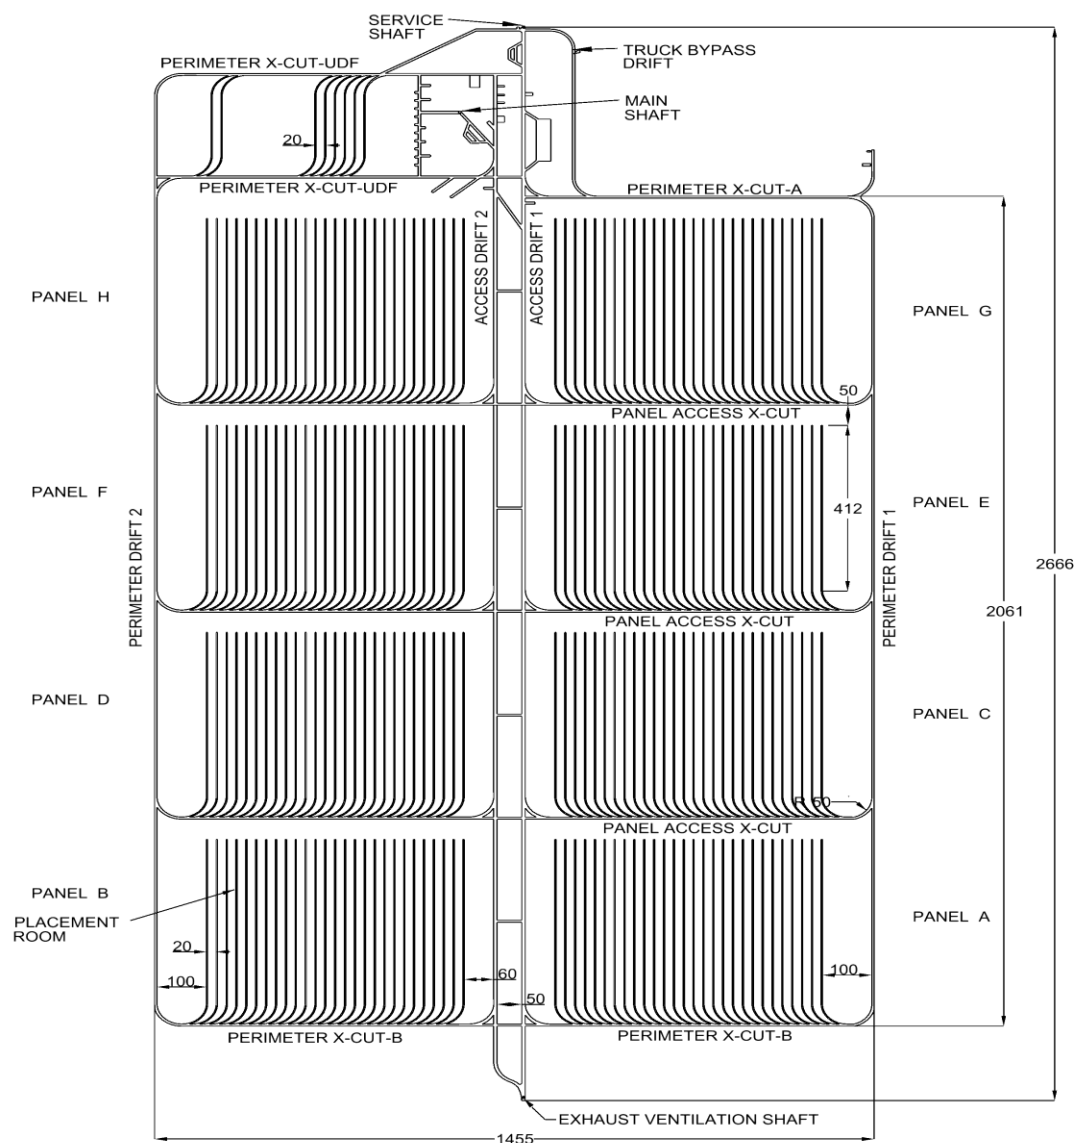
Underground repository layout for the horizontal tunnel placement method.
